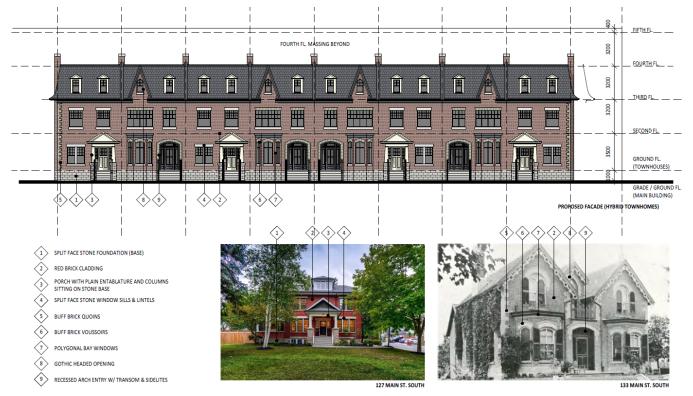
Integration of historic building elements into proposed development (source: Amico Properties)
